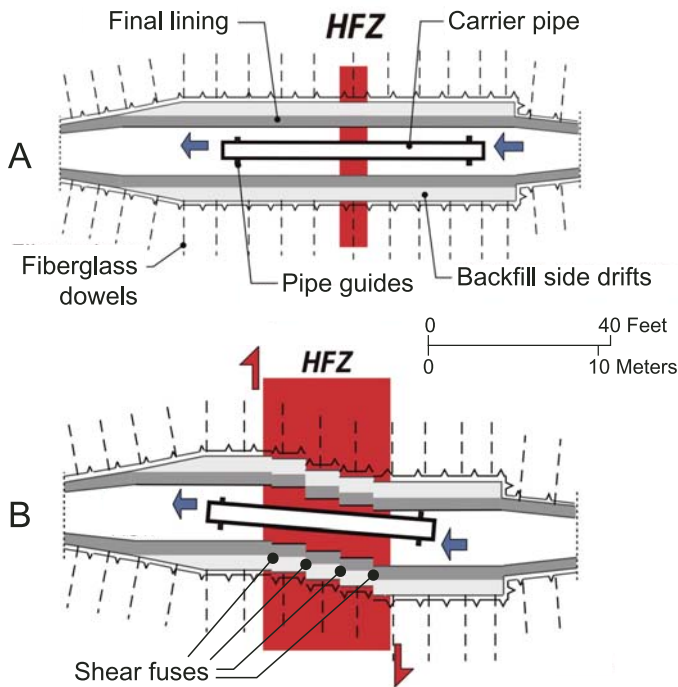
Plan view showing structural carrier pipe before and after 8.5 feet (2.6 m) of distributed fault offset (HFZ—Hayward fault zone). Modified from Kieffer et al., 2004.
